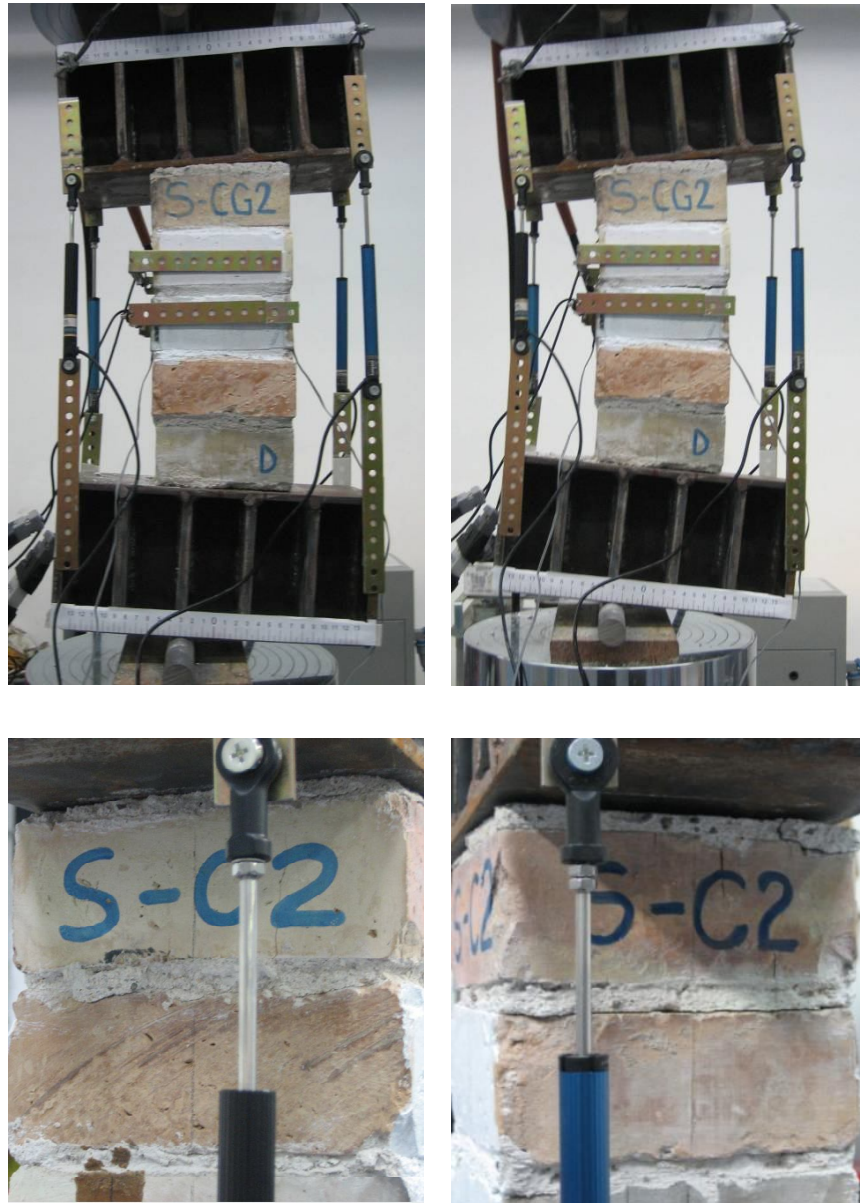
Crack pattern evolution of eccentric axial load test on S-C2 brickwork specimen: deformed configuration (up) and detail of the cracks in the compressed edge (down, left side) and of the opening of the bed joint (down, right side).
